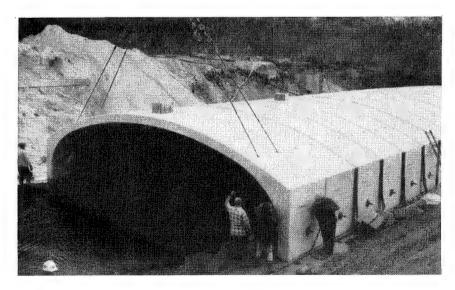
Joint wrap being applied to precast arch-box sections, Kent County (from Hurd 1990)
